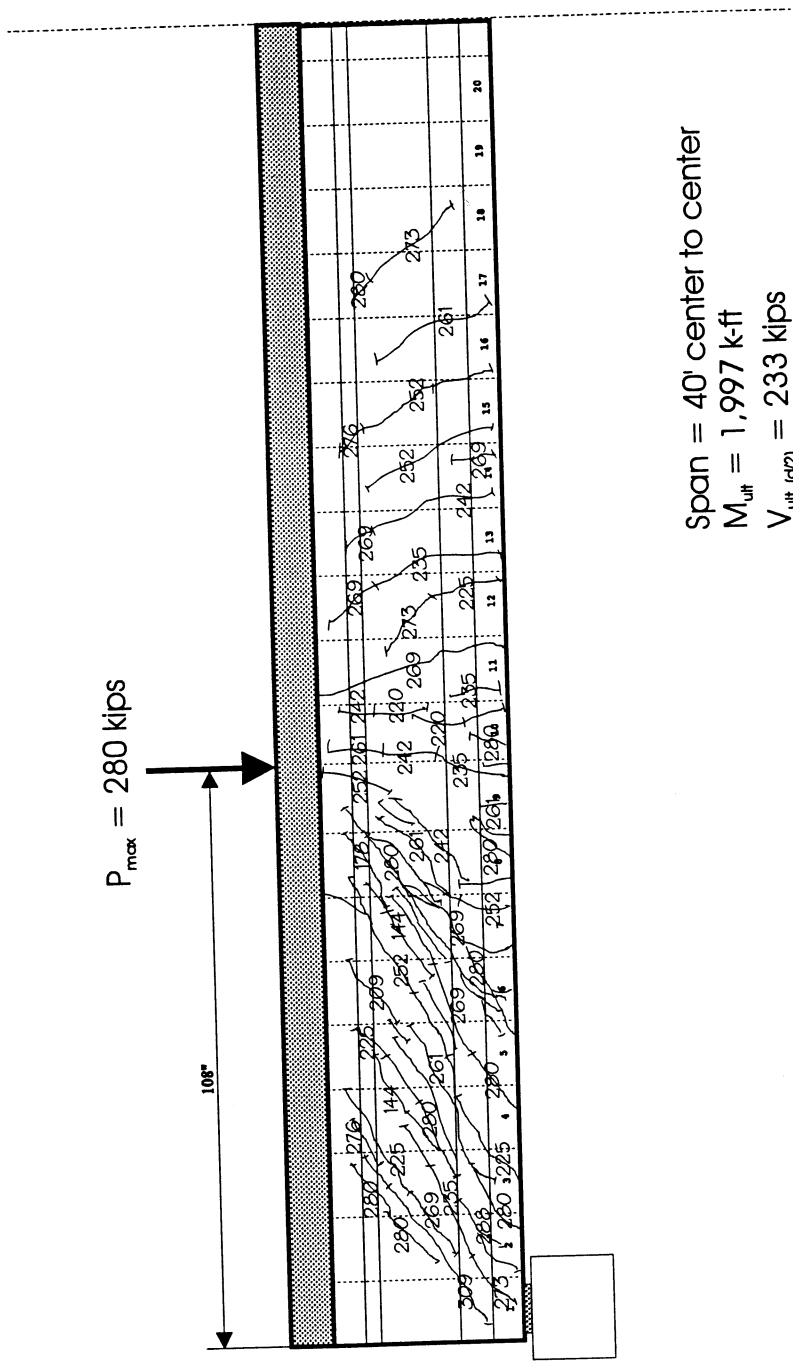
Cracking Pattern for Girder 2R-8-N
